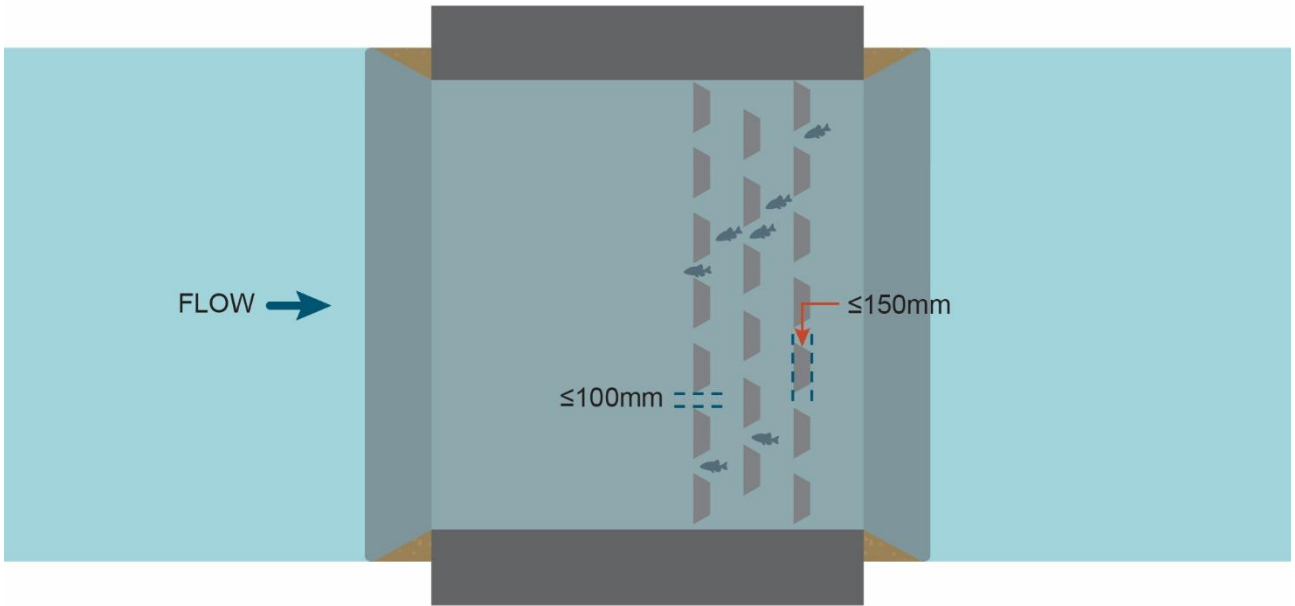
Interim floor baffles on existing culvert crossing (plan view) – tidal (grey), purple, red, amber and green waterways
